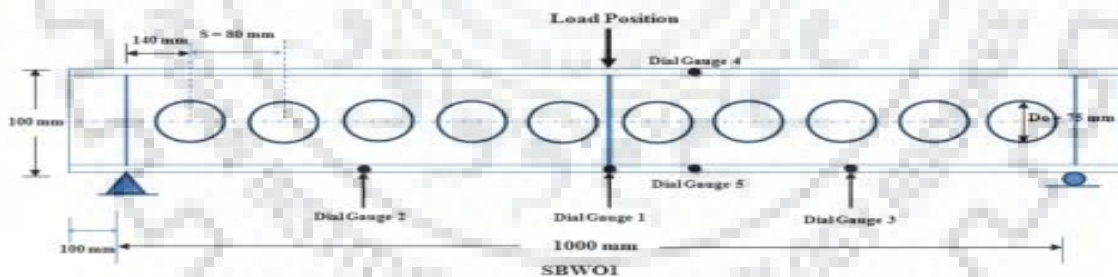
9 Beams specimen details (G. Morkhade et al, 2015)
